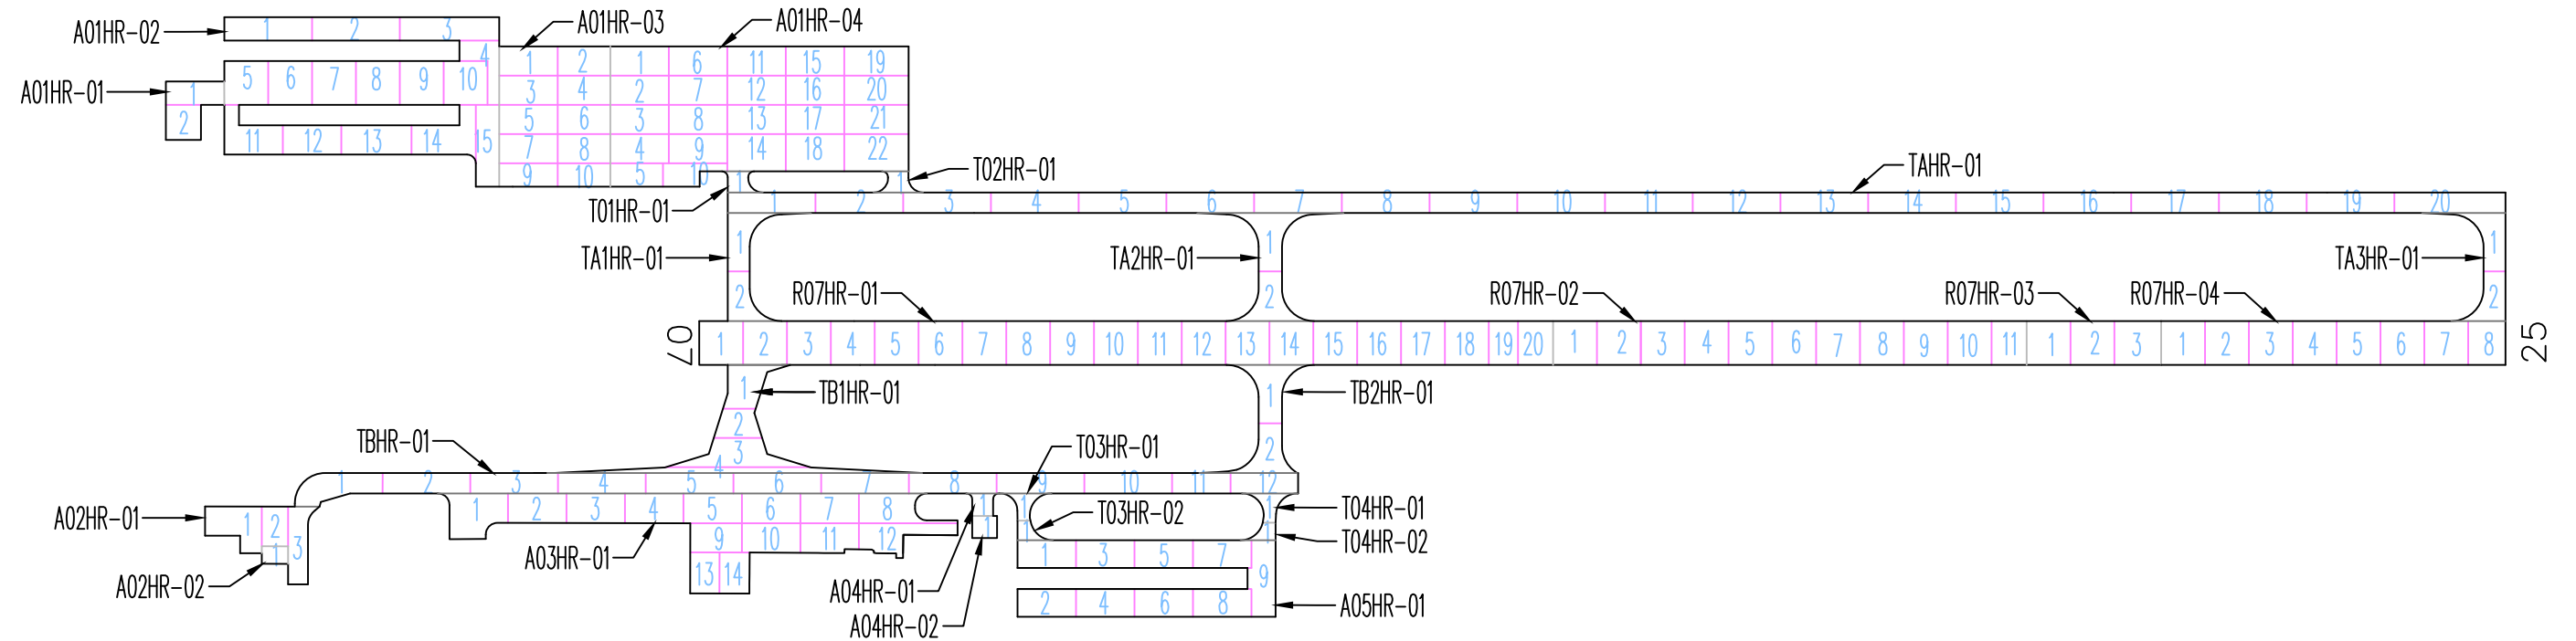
Pavement Branch, Section and Sample Unit Layout.
